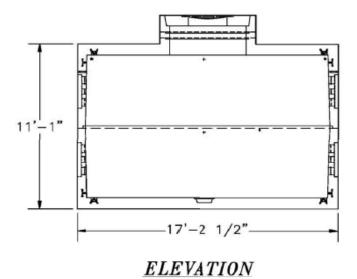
Proposed 69-kV Splice Vault (typical) Source: SDG&E 2017
